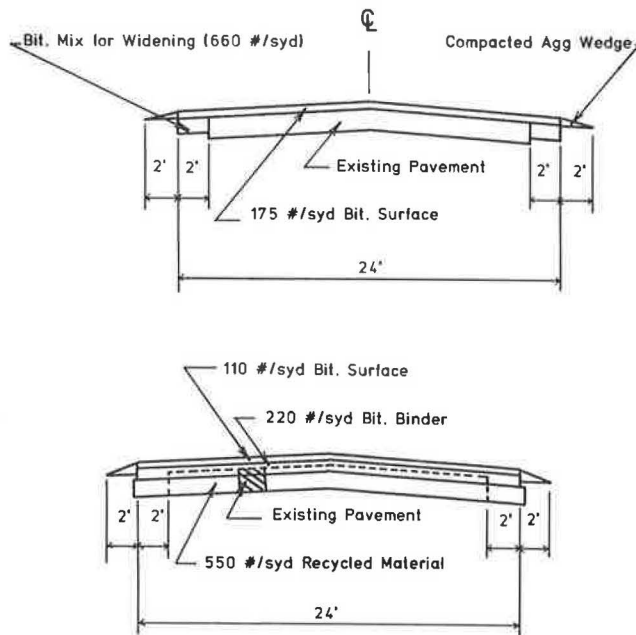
Typical cross sections: *top*, resurfaced pavement; *bottom*, recycled pavement.
